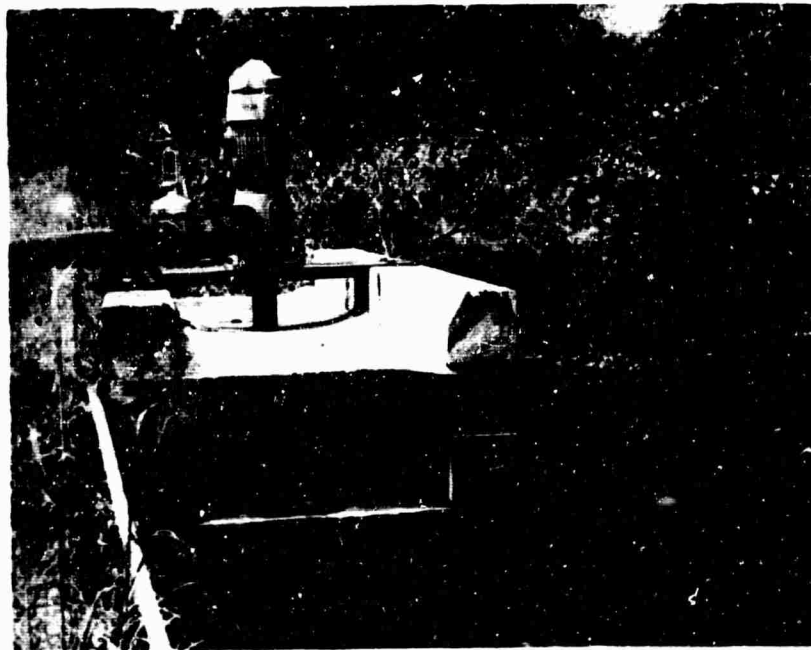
Pre-Shot of Pump Crib for Bleed-Down Plant
